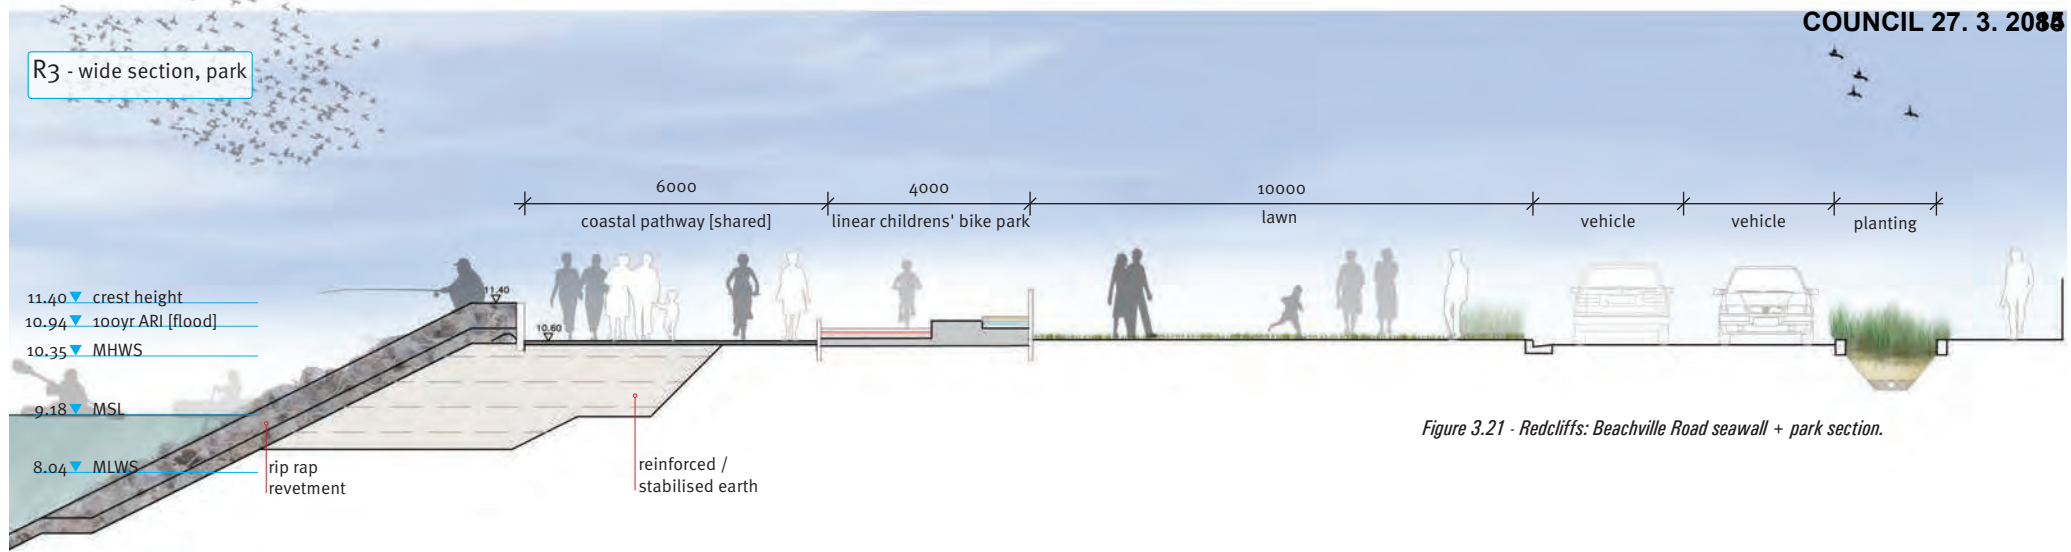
Redcliffs: Beachville Road seawall + park section.
